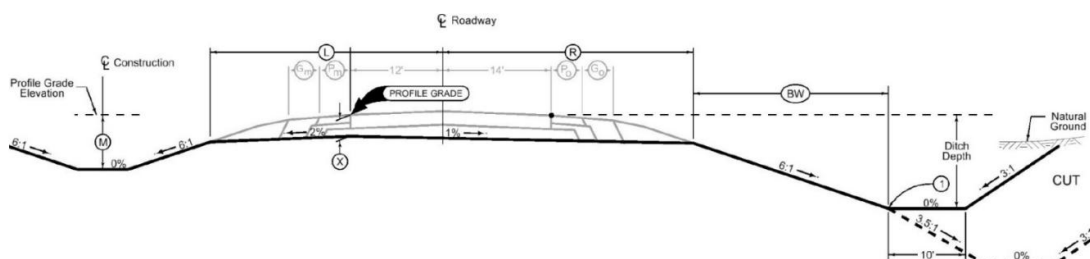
Typical cross section of a normal ditch (Iowa DOT Office of Design, Design Manual, Chapter 1, 3G-1).
